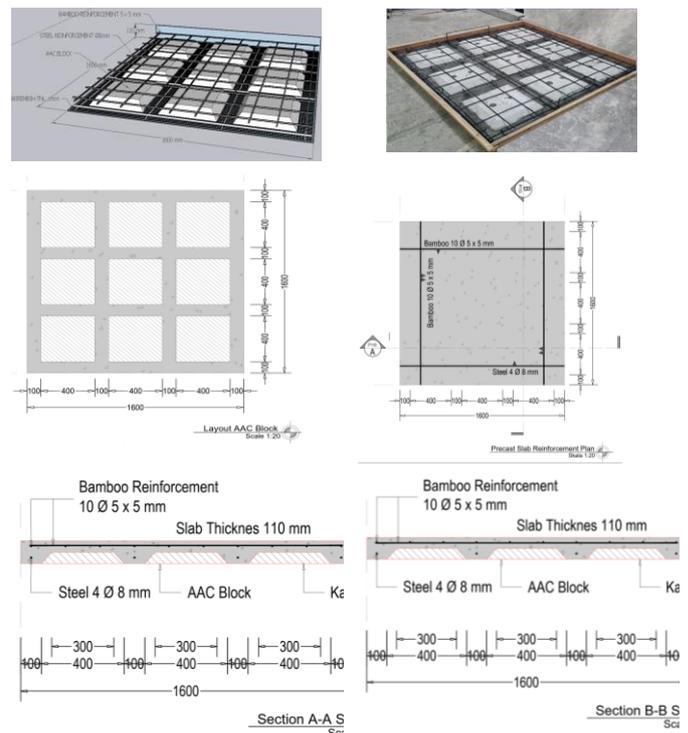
Details of panel reinforcement and installation of bamboo reinforcement, steel reinforcement, and wire mesh
